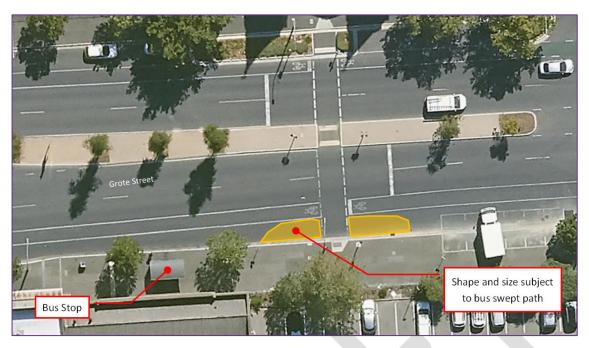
Kerb Built-Out or Extension at the Signalised Crossing
